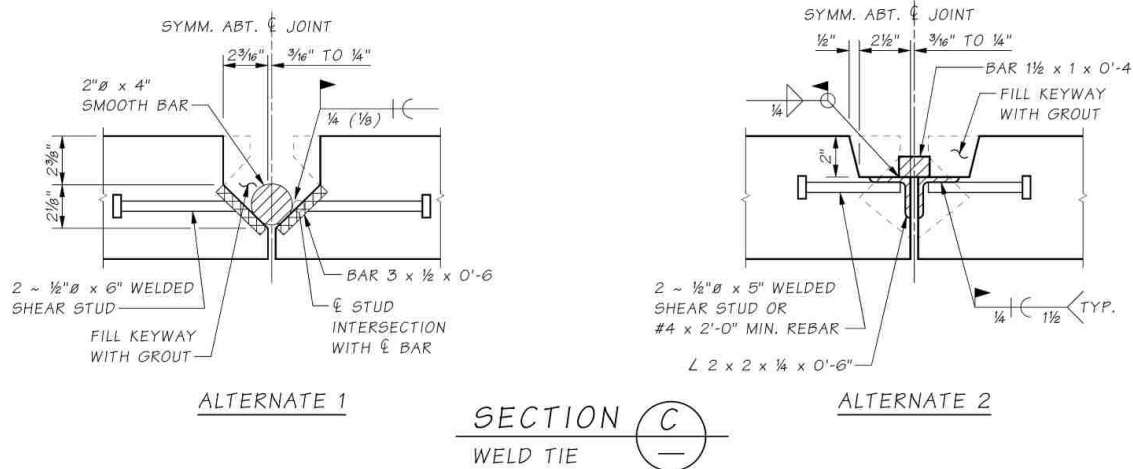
Existing WSDOT detail for connecting adjacent DBTs.
